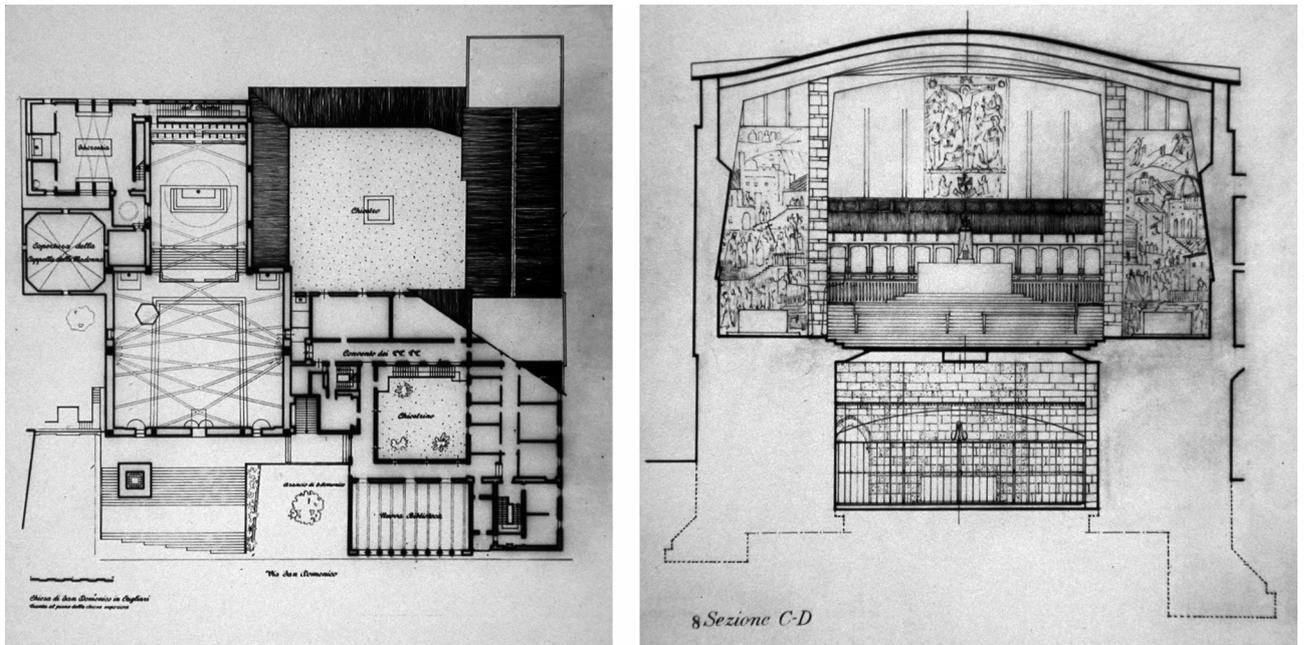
Upper church and monastery level plan, with roof ribs projection (left); transversal section (right)
